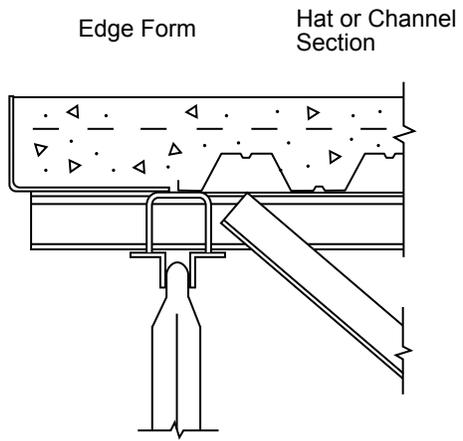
SINGLE PIECE EDGE FORM PARALLEL TO DECK ON OPEN WEB JOIST GIRDER
